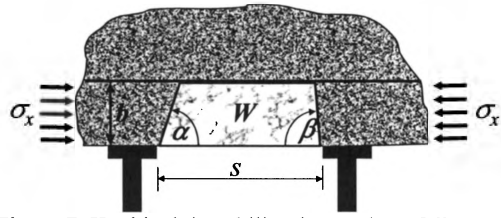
Keyblock instability due to shear failure at the abutments.
